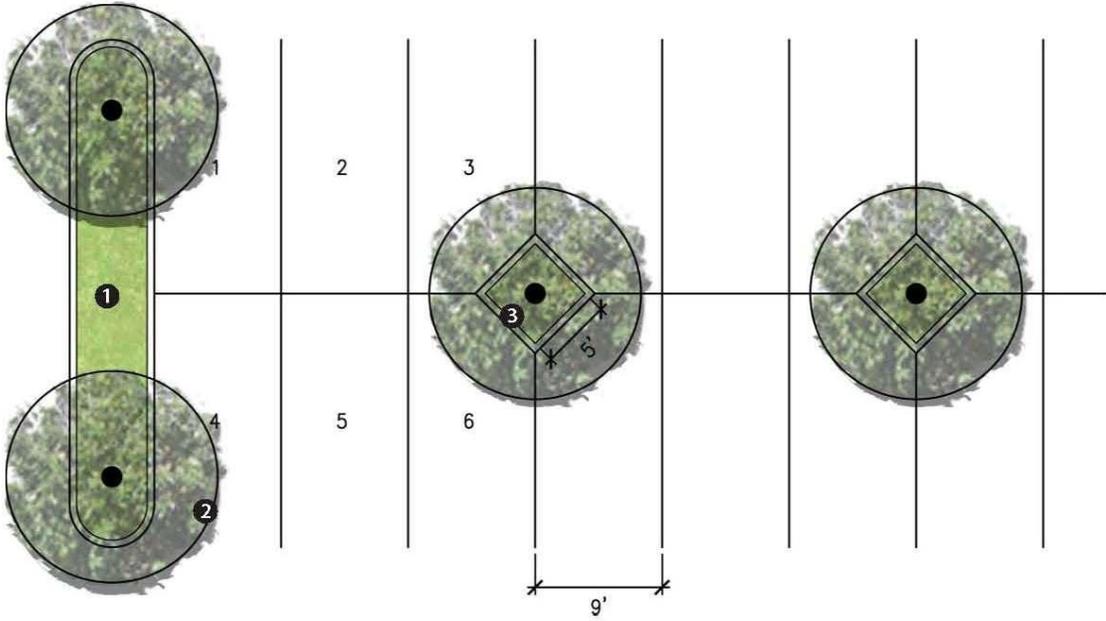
I-15/I-215 Edge Condition at Parking Lot
